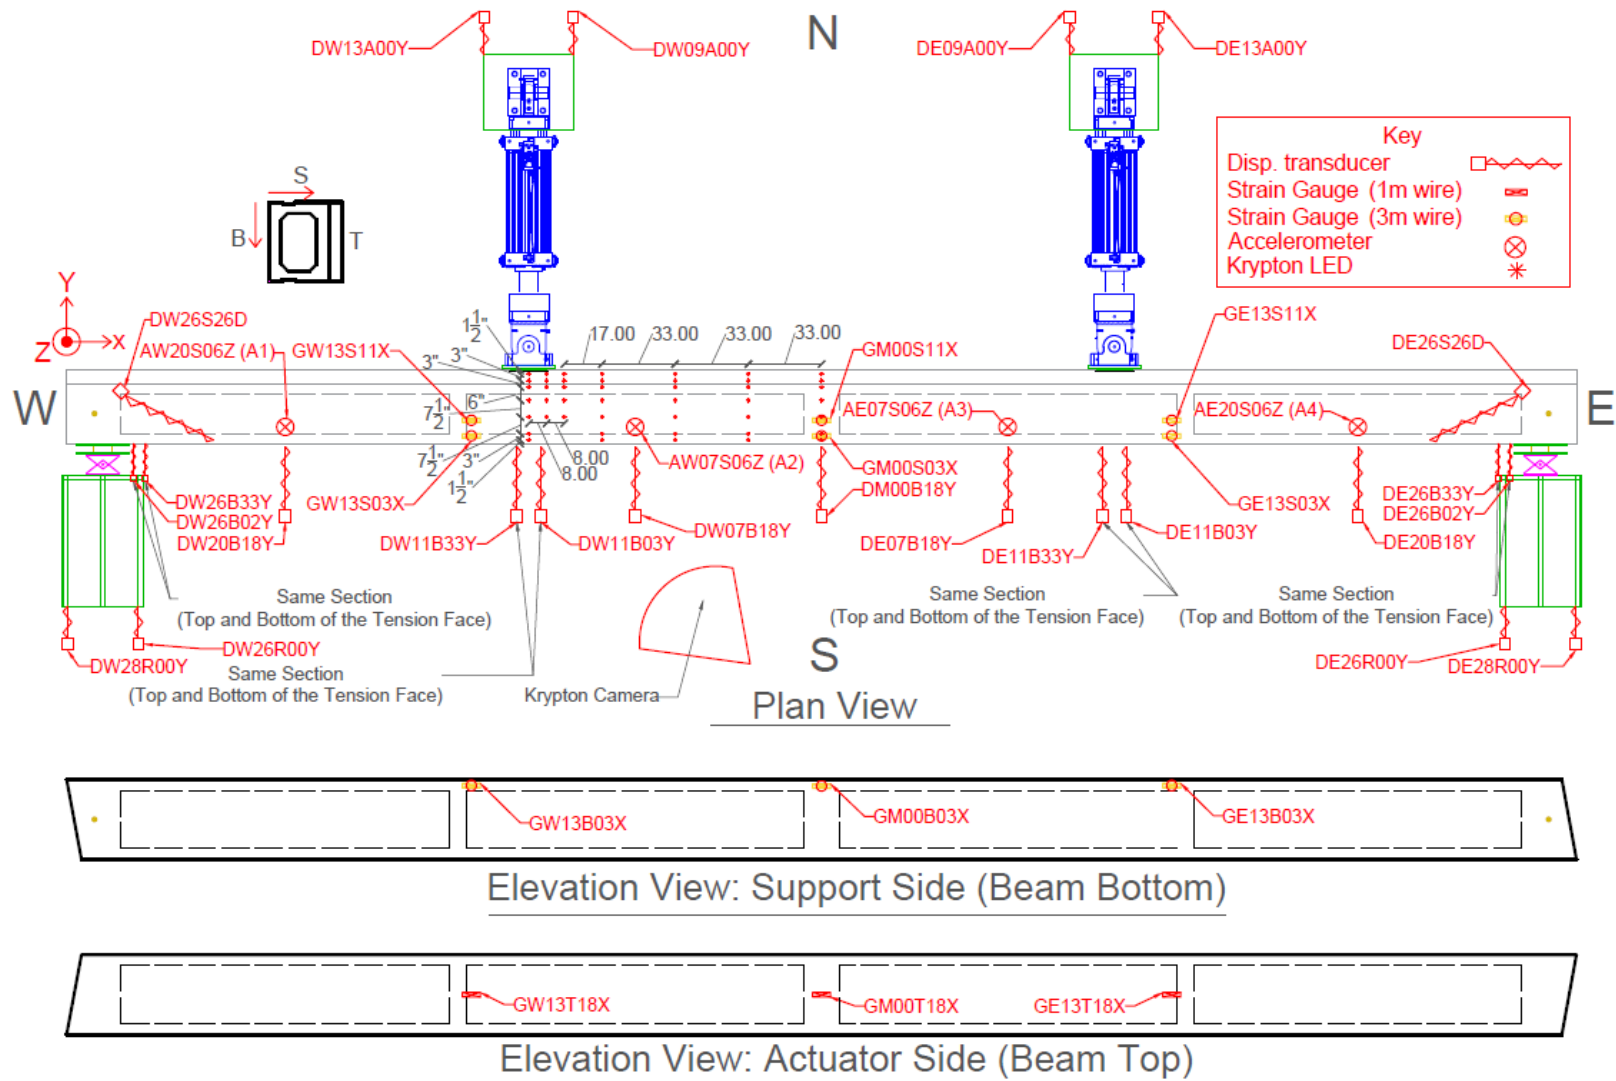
Beam 2 Instrumentation (service-level tests)
